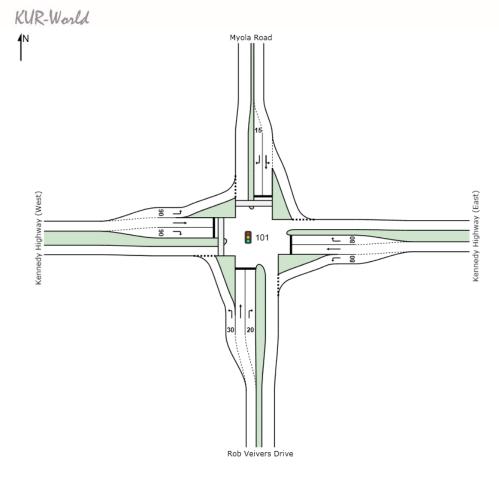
Kennedy Highway / Myola Road / Rob Veivers Drive intersection layout
